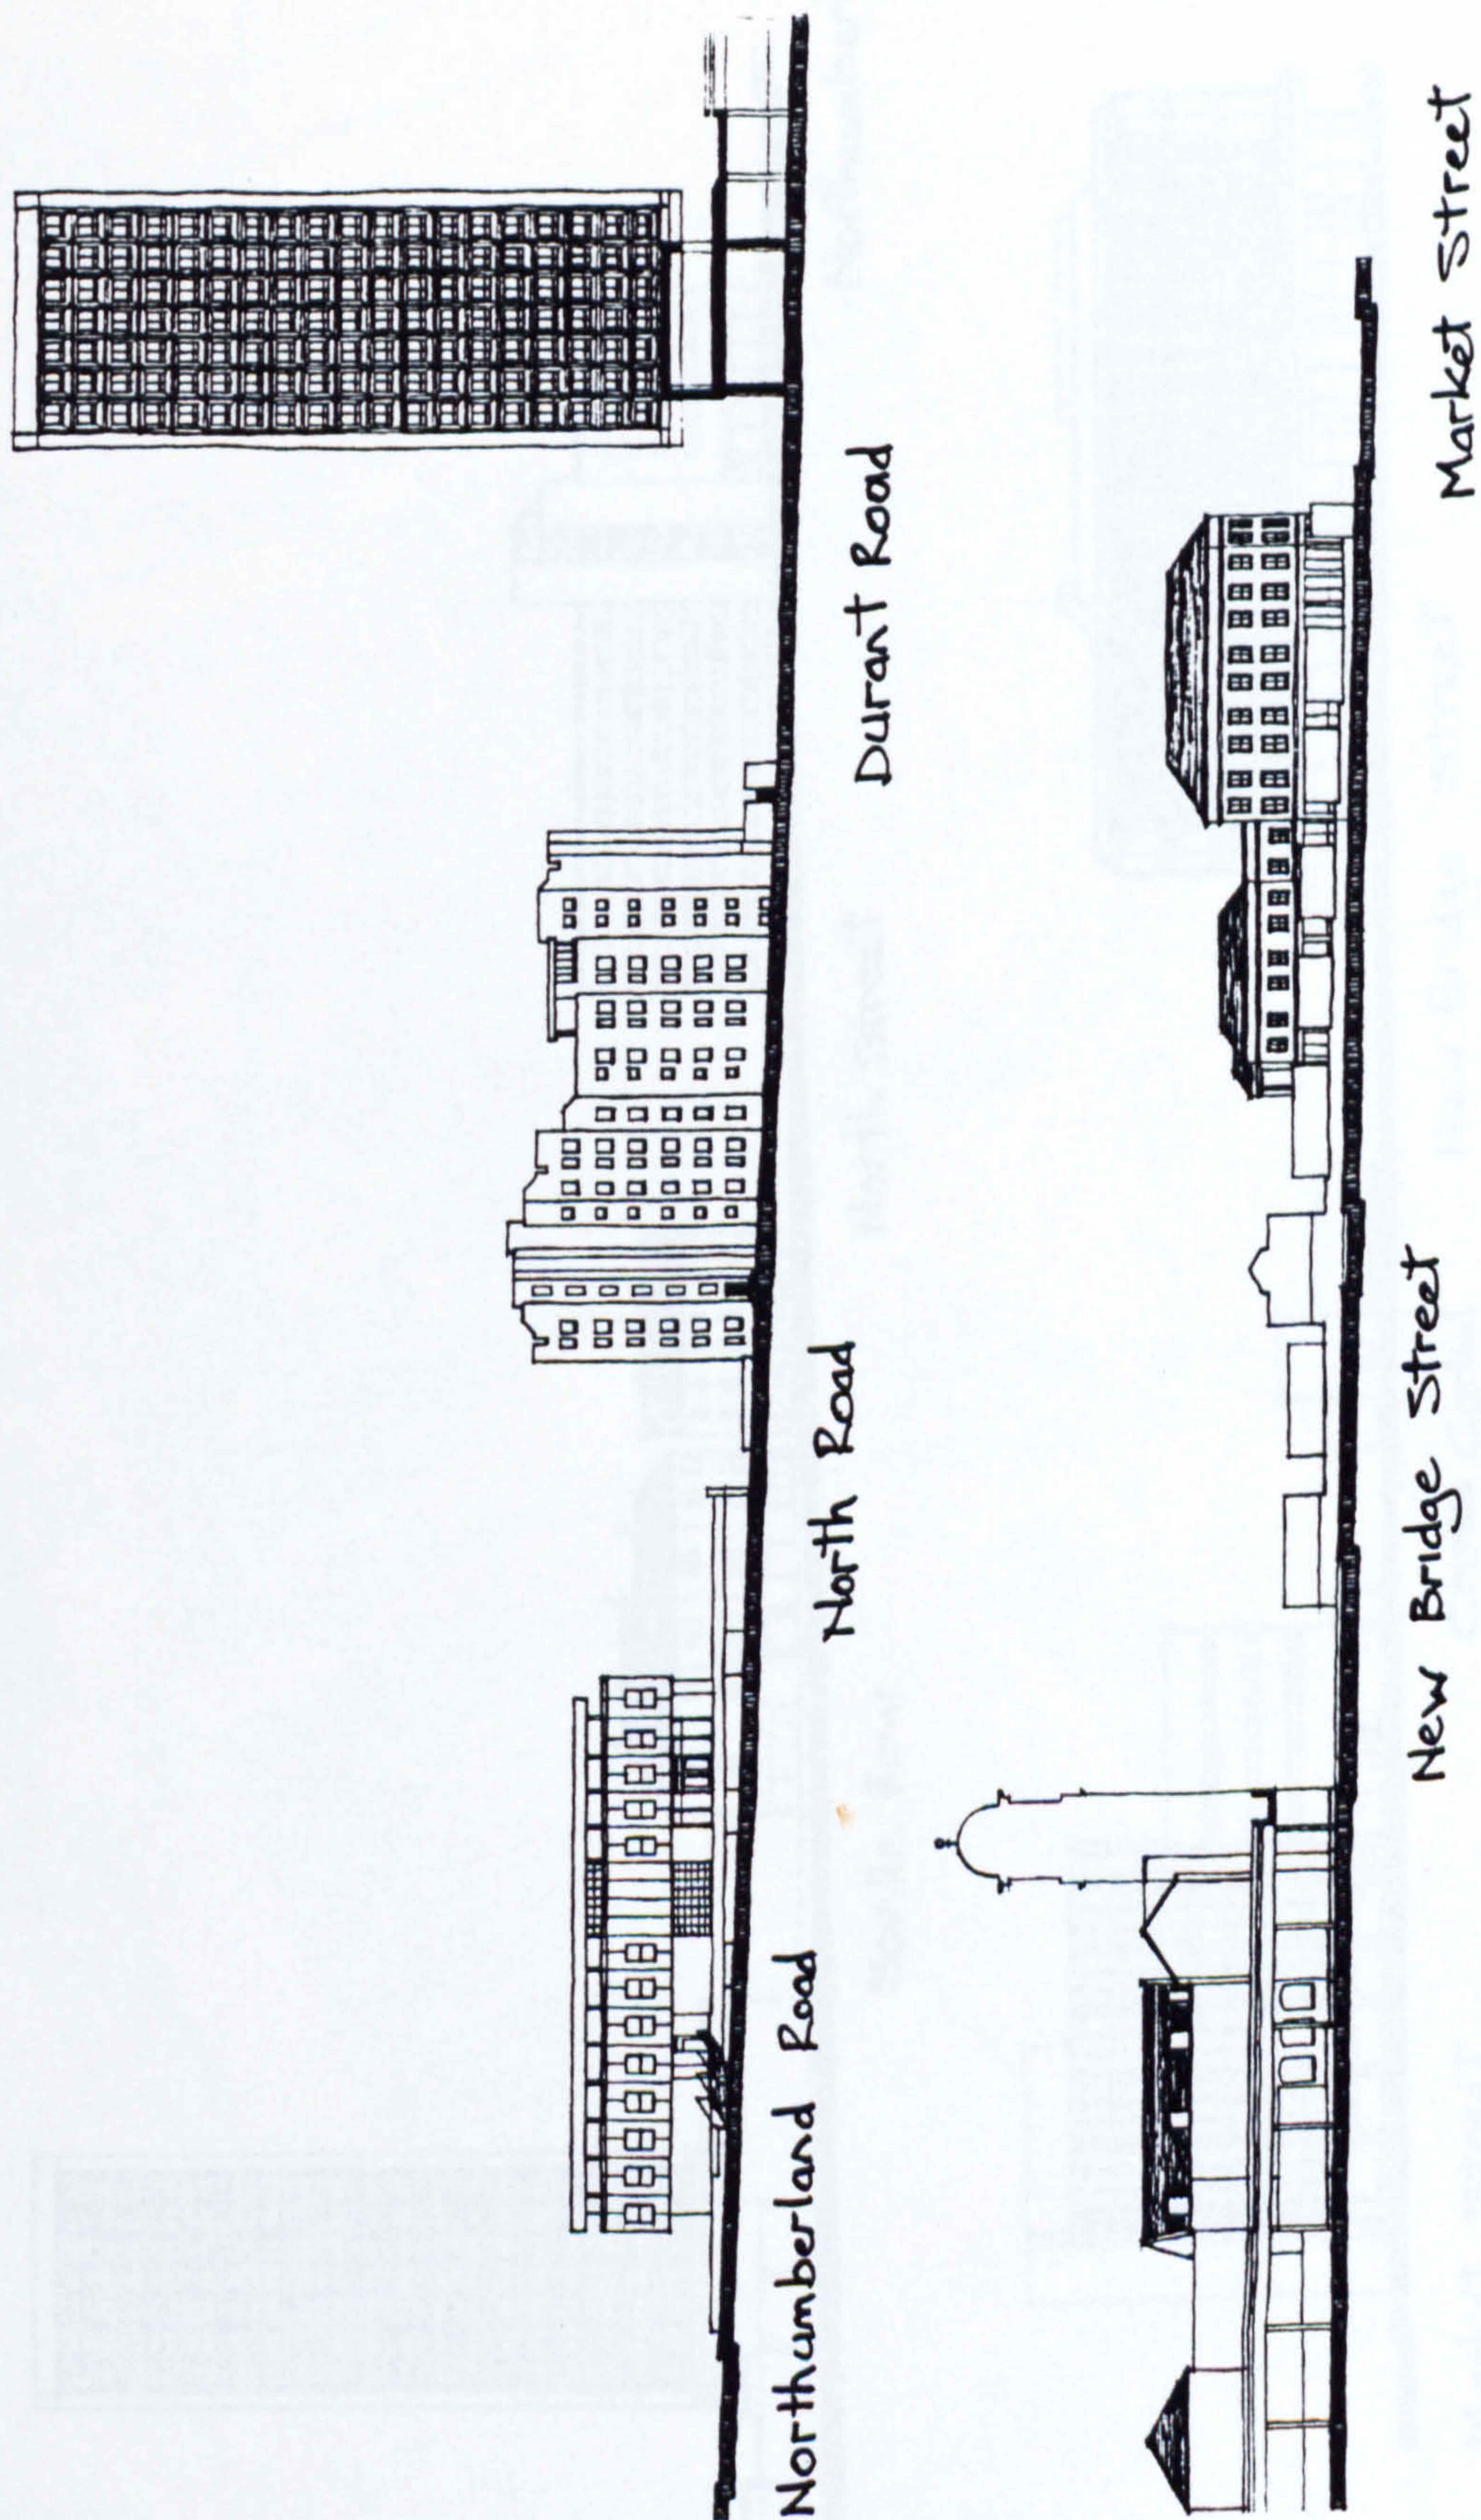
JOHN DOBSON STREET EAST SIDE ELEVATIONS 1991
